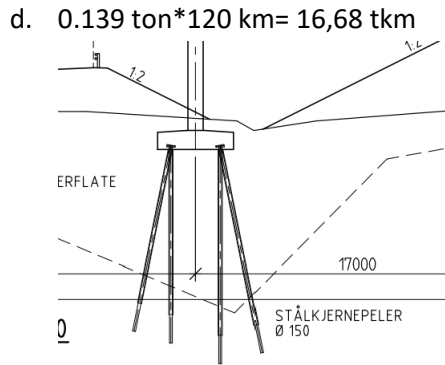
An example of designed steel piles, this drawing has been taken from a technical drawing for Otnesbrua K001.
